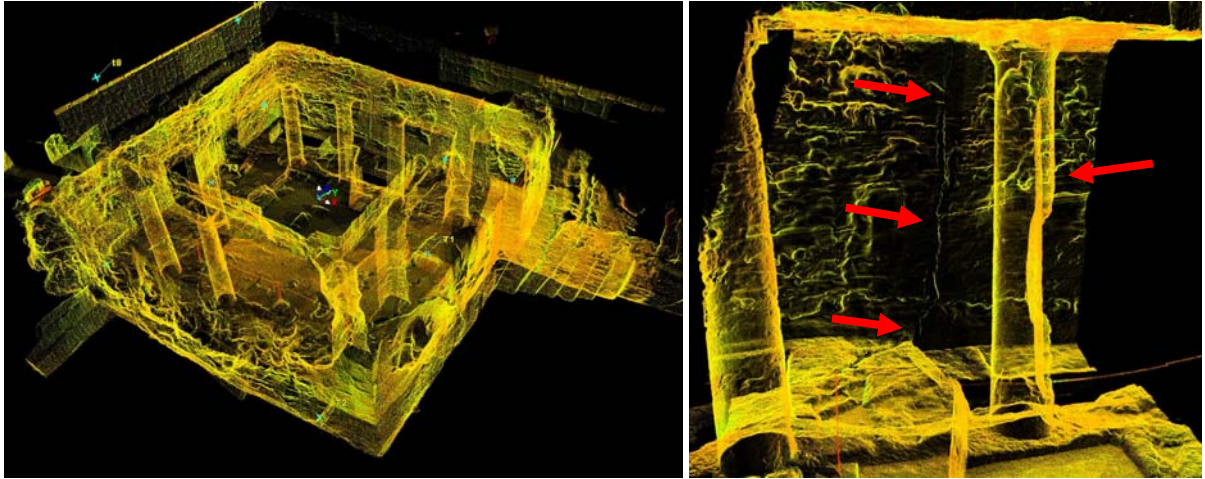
General preview of the point cloud (left); detail indicating cracks along the east wall and column of the tomb (right).
